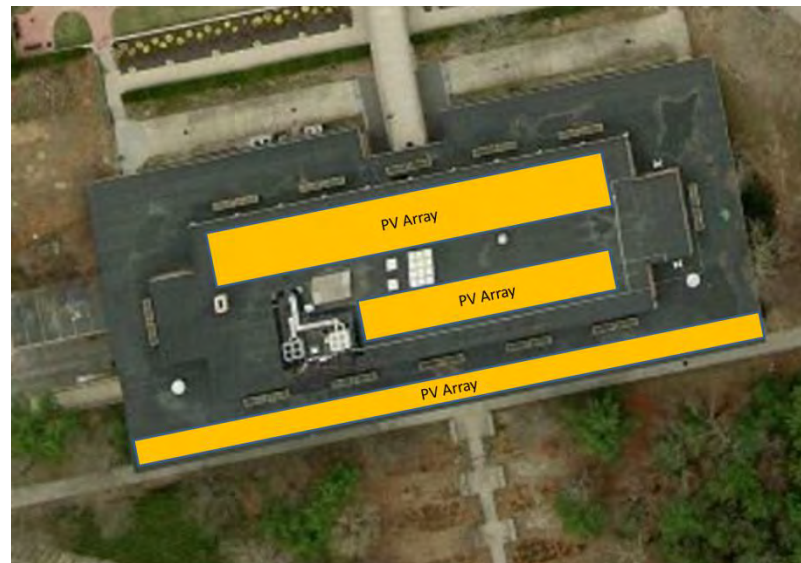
Roof of Riverhead Technology Building with possible PV array arrangement.
